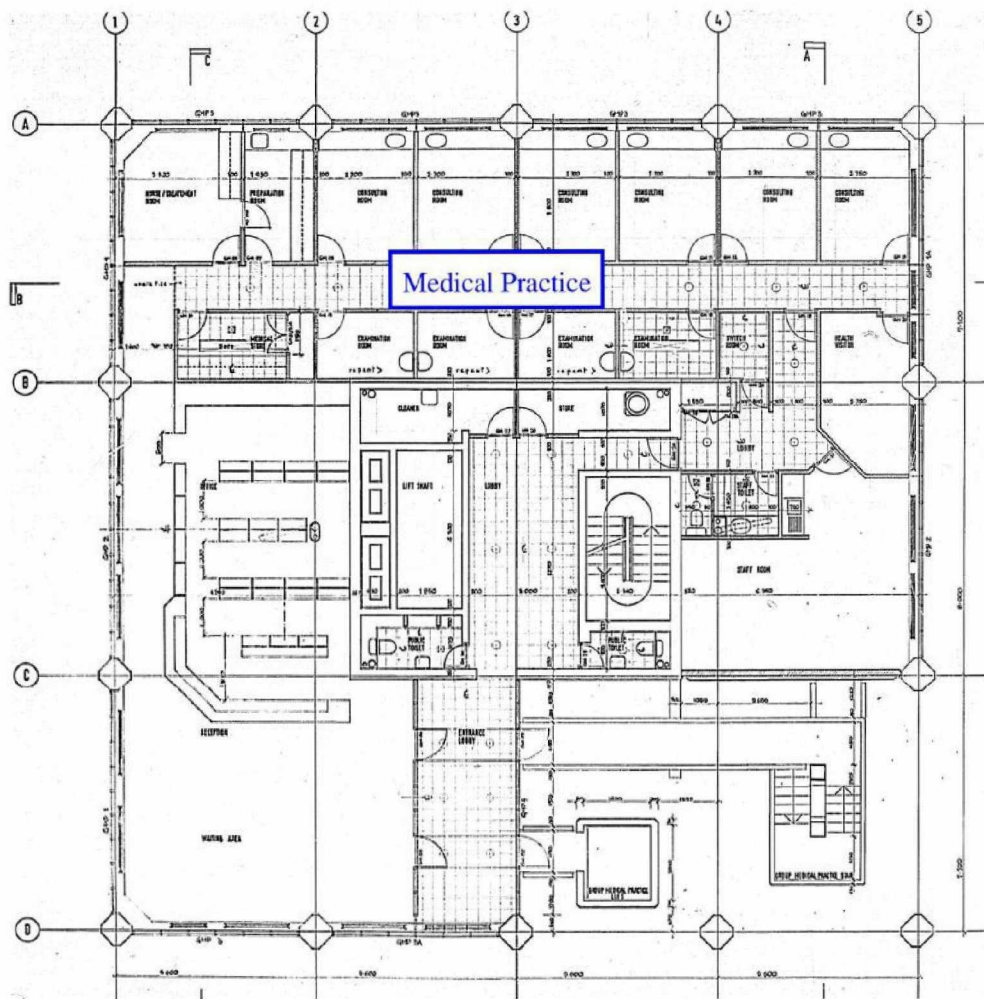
Original level 3 floor plan. (RBK00018834)
